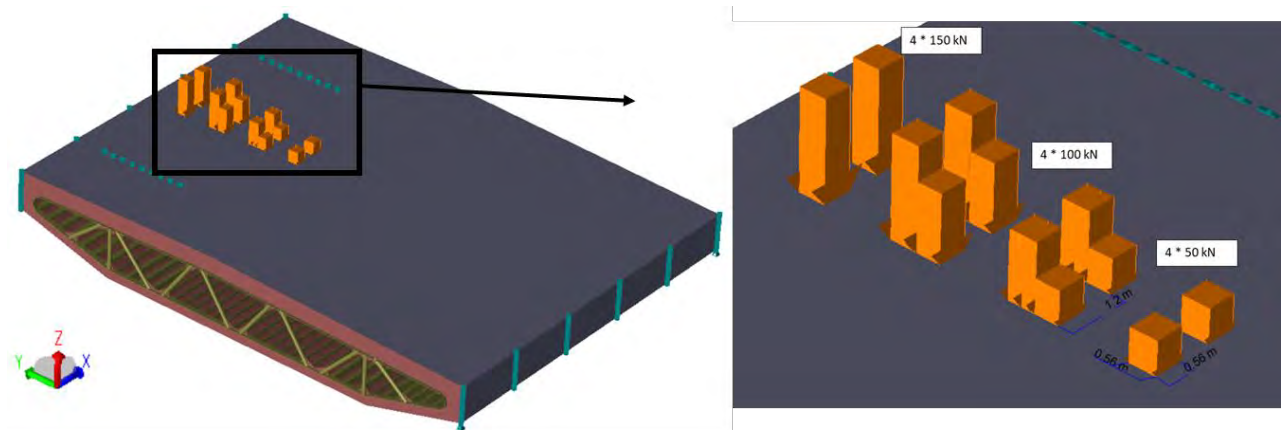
Applied concentrated traffic load in local analysis of bridge girder
